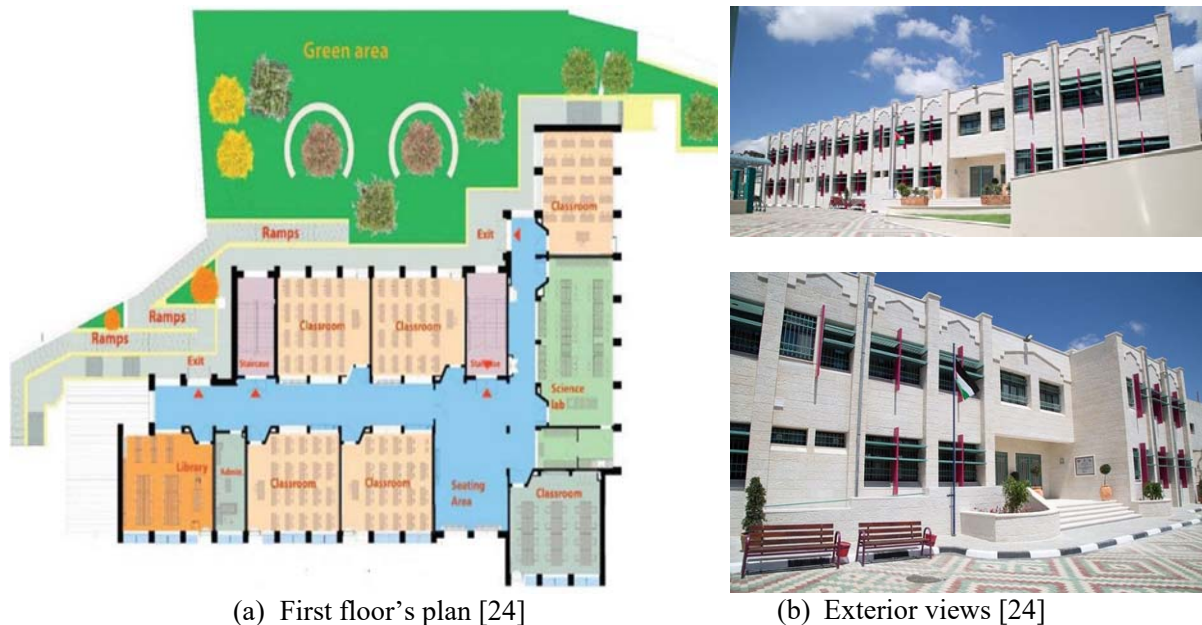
Aqqaba green school: (a) First floor's plan; (b) Exterior views
